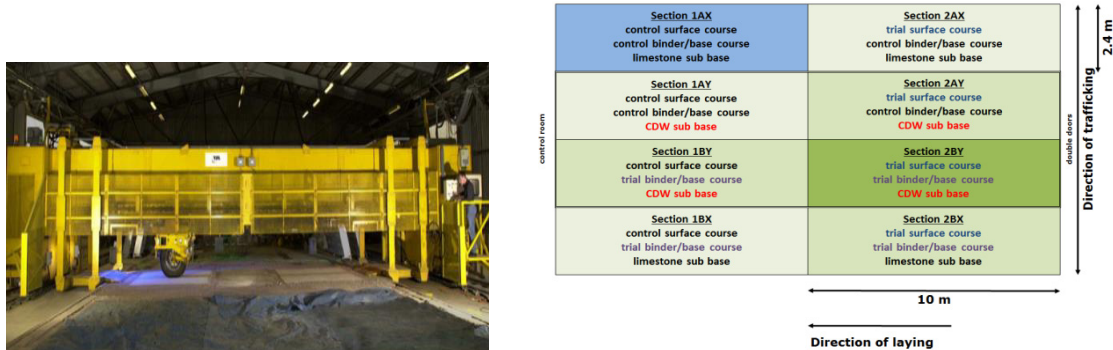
The TRL Pavement Test Facility and proposed layout of trial sections.
